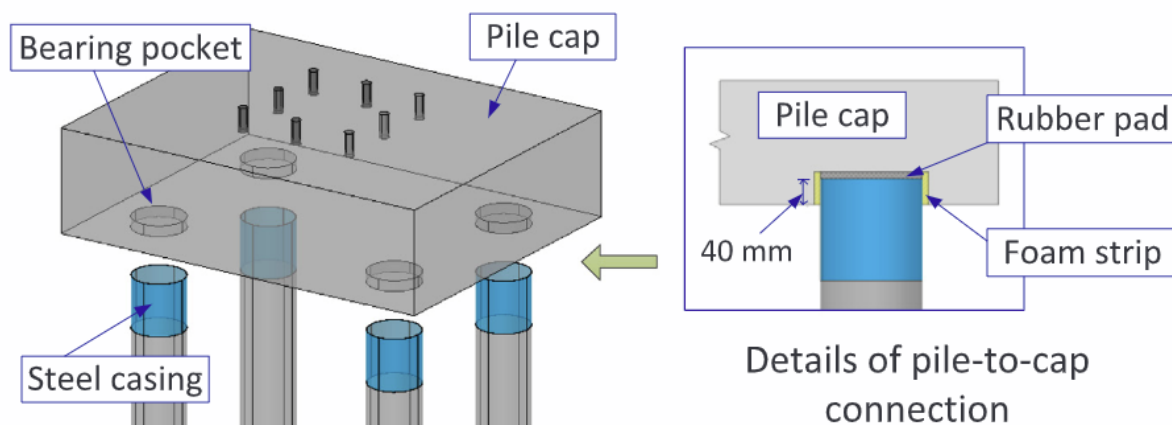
Connection details for pile-to-pile cap connection (Guan et al. 2018)
